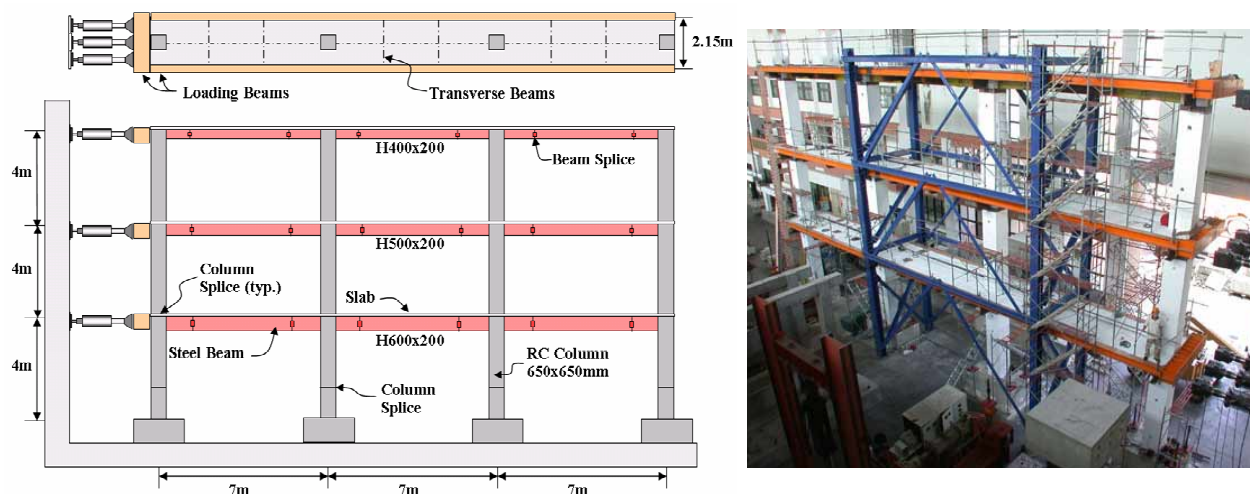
Plan and elevation views and photo full-scale composite test frame
